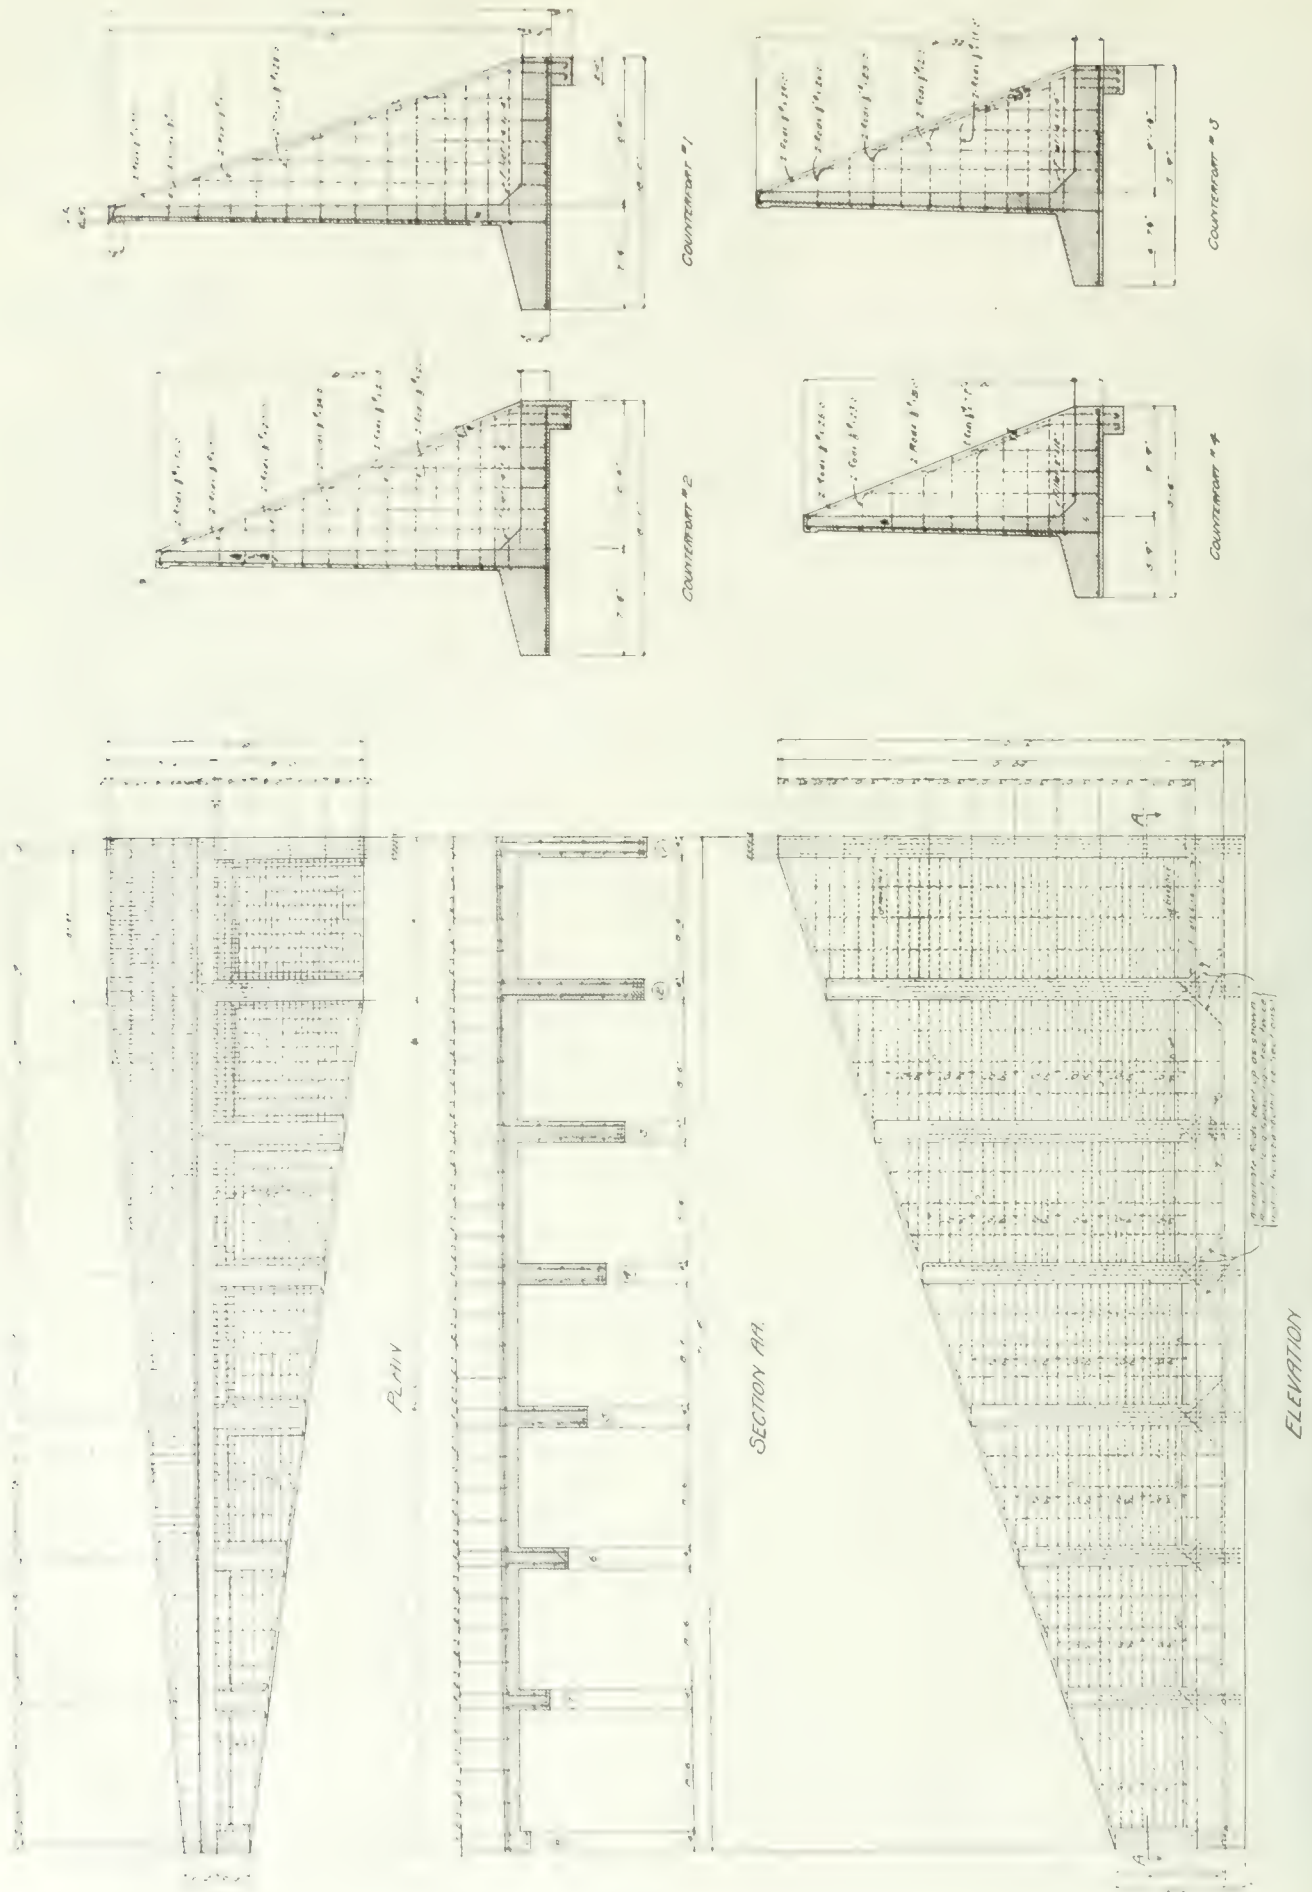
Details of the north wall, showing plan, elevation and sections of four of the eight counterforts.
